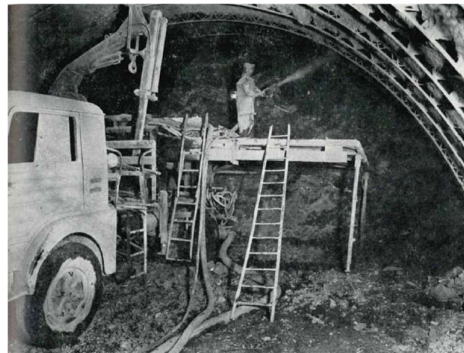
Use of shotcrete in the tunnels Genova Sestri Levante constructed in the 60's (left) (Gentili, 1969)
